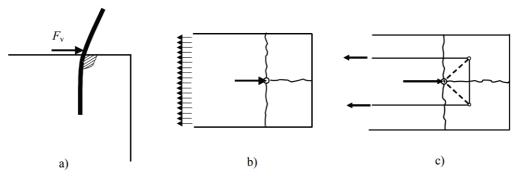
Splitting effects around dowel pin loaded in shear, a) shear force acting on dowel bar indicating area of concrete under dowel subject to high stress concentration, b) potential planes of cracking, c) strut and tie model for design of splitting reinforcement – no splitting reinforcement found within wall panels.
